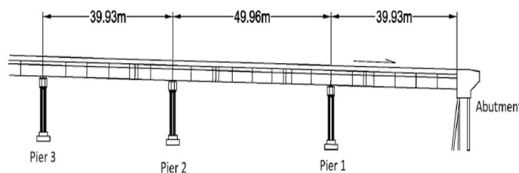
Elevation view of the examined segment of the I-40 Bridge. (Adapted from Farrar et al. (7,16)).
